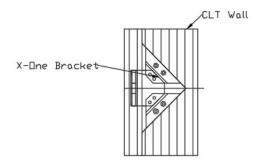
B 1"=27.5" Typical CLT-DLT Connection
